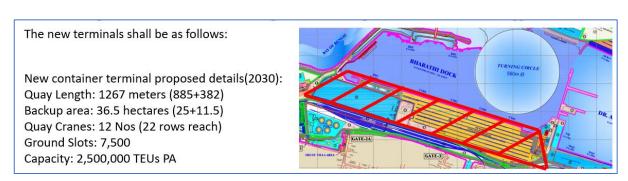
Development Plan for 3rd Container Terminal at ChPA
